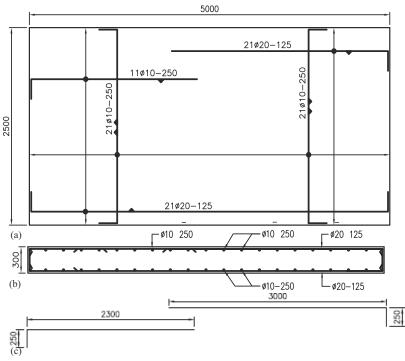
Reinforcement layout of slabs: (a) plan view of S1 and S2, (b) section of S1 and S2, (c) Detail of top reinforcement. All slabs had similar longitudinal reinforcement. Units: mm (1 mm = 0.04 in.)
